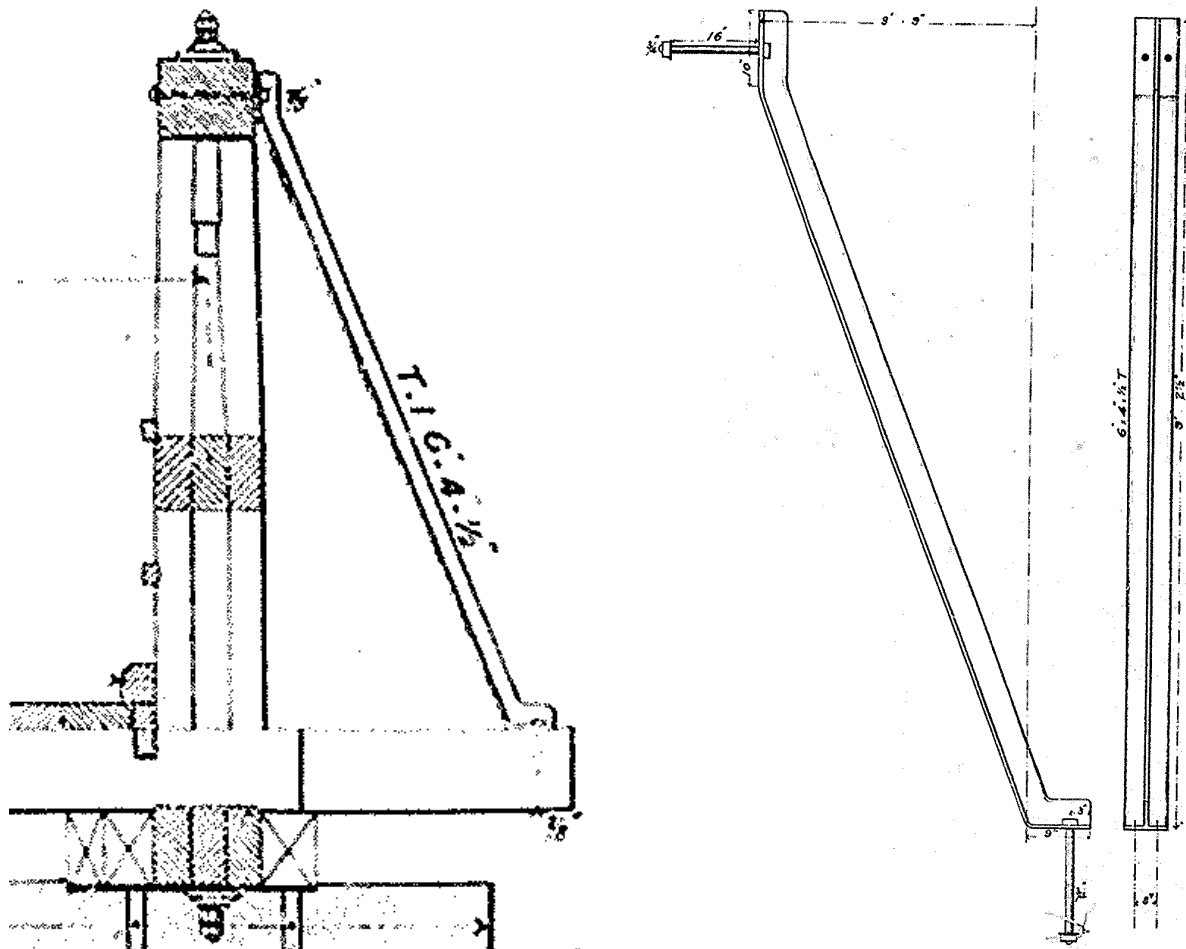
Plan of Sway Bracing for 90' McDonald Truss at Tarraganda
